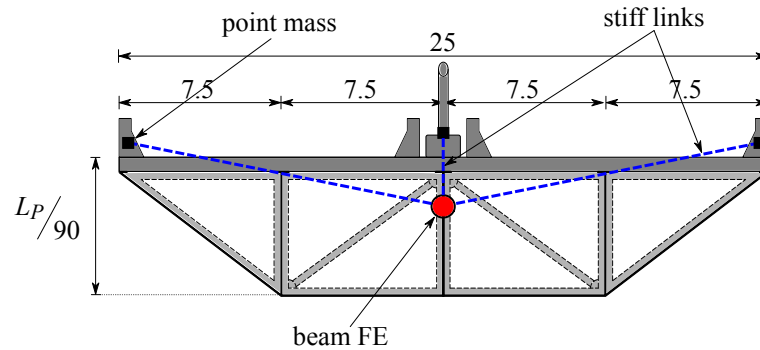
Finite element model of the deck section in bridges with one CCP. Dimensions are in [m].
